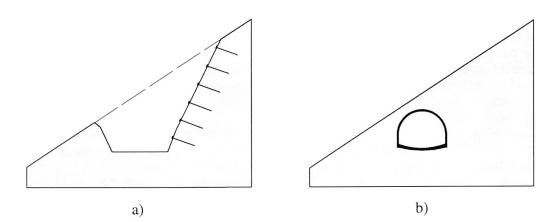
Cut-and-cover tunnel in sloping ground a) Excavation and support of slope b) Construction of tunnel arch and backfilling
